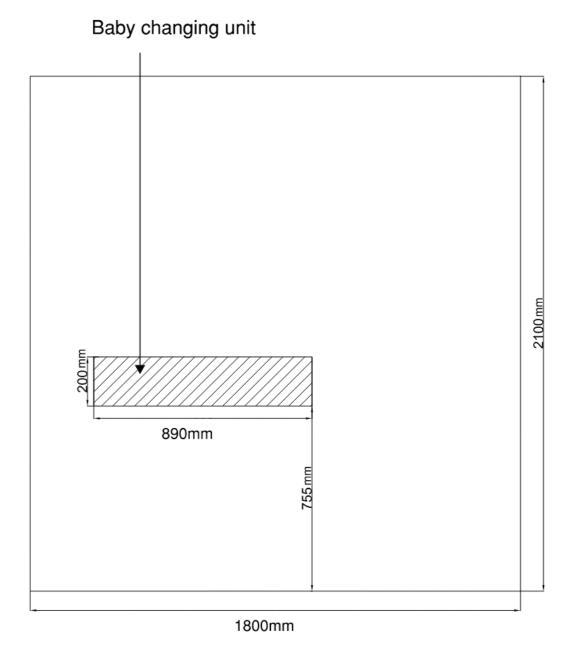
Indicative drawing for a toilet with baby changing facilities and space for a CTD (elevations).
